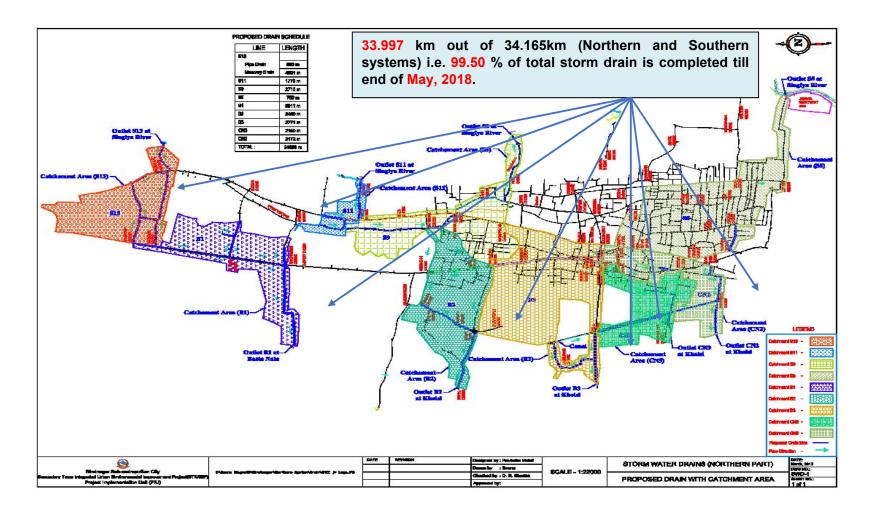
PROPOSED STORM WATER DRAINS IN BMC (Northern Drainage System)
